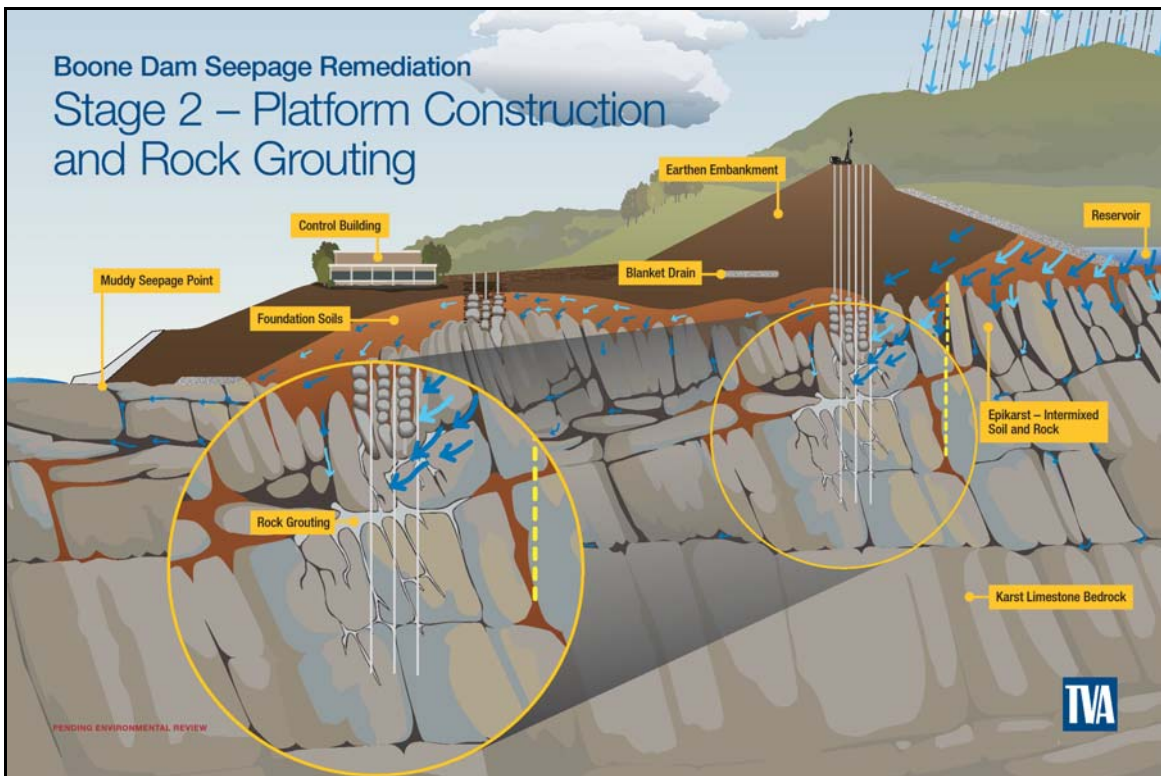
Conceptual Schematic of Stage 2 Construction of Seepage Barrier
